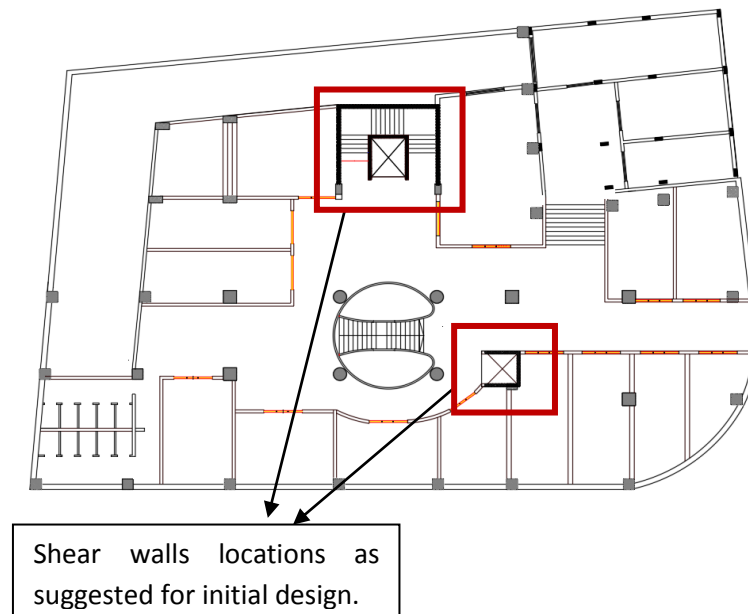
Example of a building where shear walls are located around the elevator and the stair case to satisfy architectural constraints.
